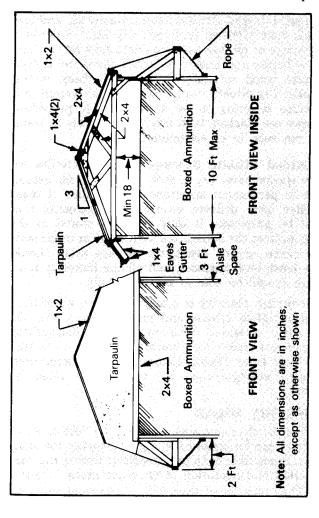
Cross Section Details of an A-Frame Ammunition Storage Module.
